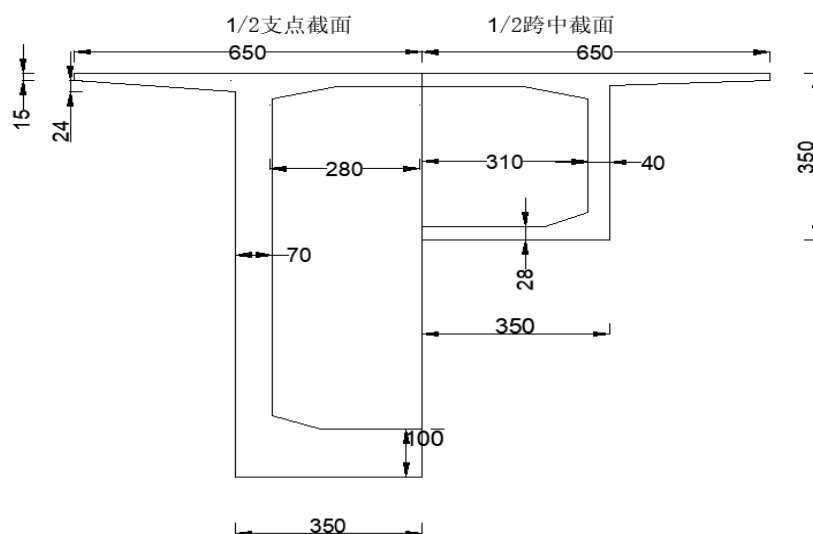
Cross-sectional view at the support and mid-span (unit: cm)
